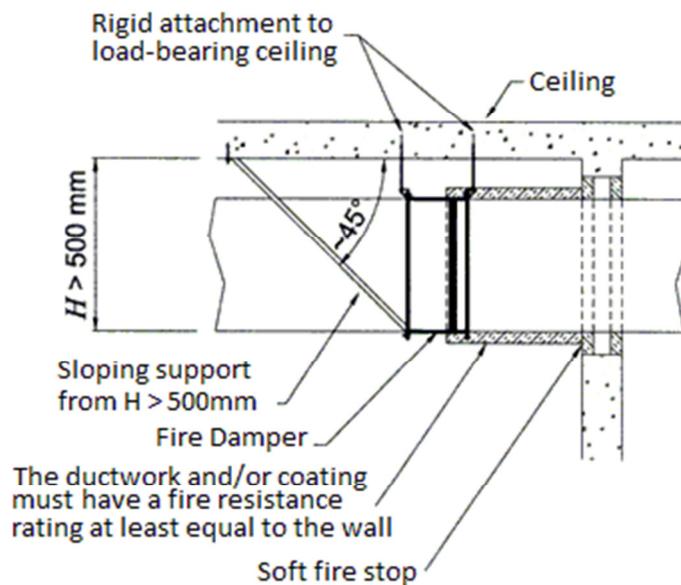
Example of the installation of a fire damper outside the wall opening suspension depth > 500 mm
